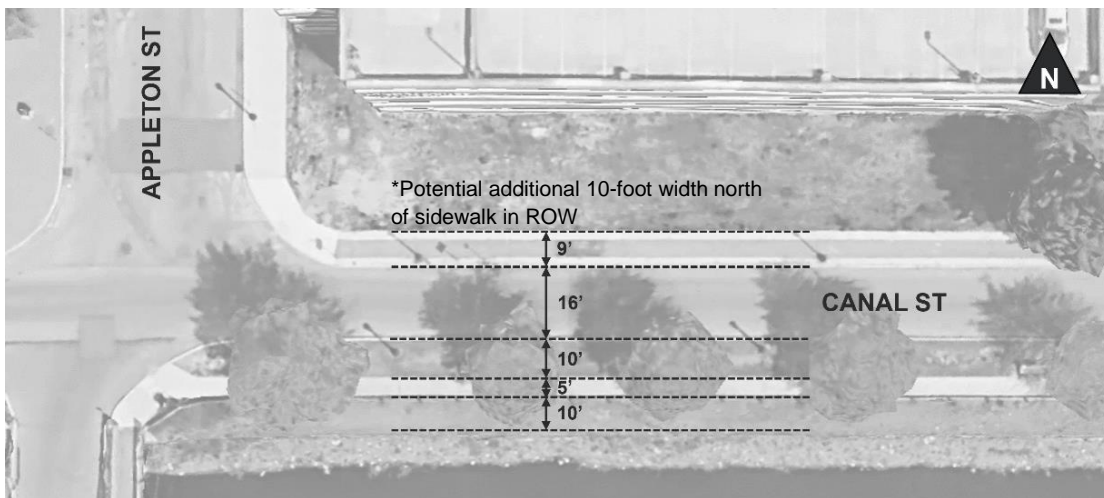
Approximate Segment 2 cross section of Canal Street near Appleton Street
